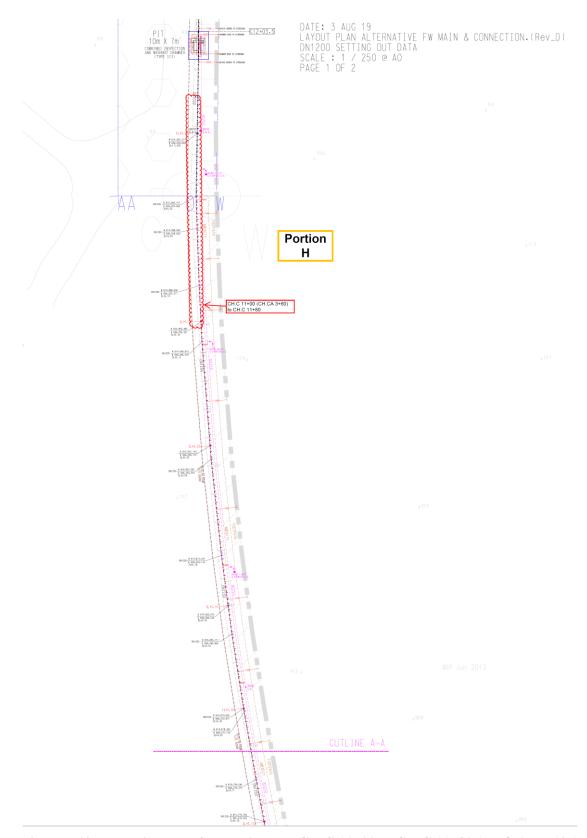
Location Plan for Portion H – CH.C 11+00 to CH.C 11+80 (TKO Area 137)
